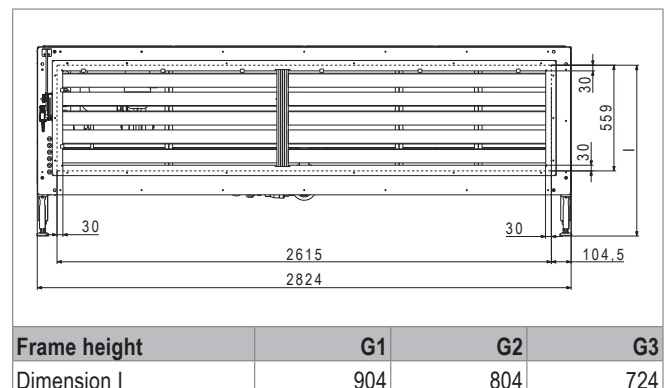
Dimensional drawing fresh air duct (dimensions in mm)
